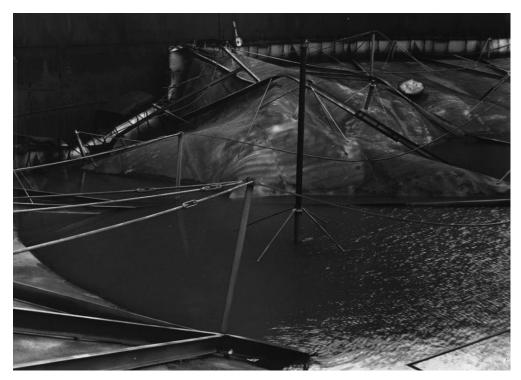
Collapse of Pan-type Roof from Excessive Weight of Water While the Roof Was Resting on Its Supports
